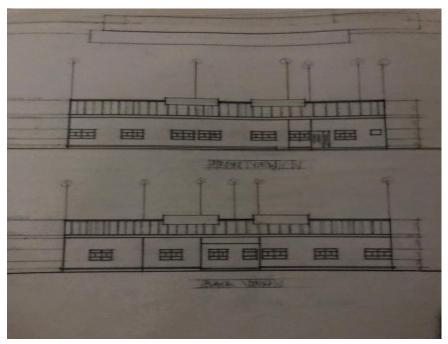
SHOWING THE FRONT AND BACK ELEVATIONS
